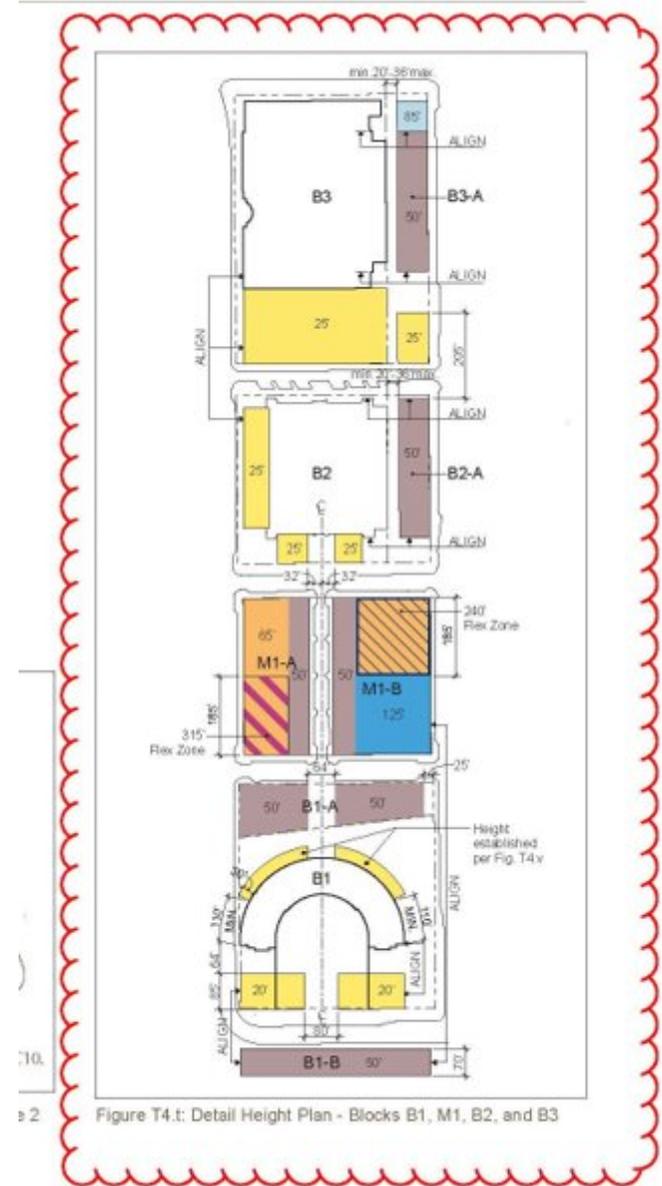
t: Detail Height Plan - Blocks B1, M1, B2, and B3
